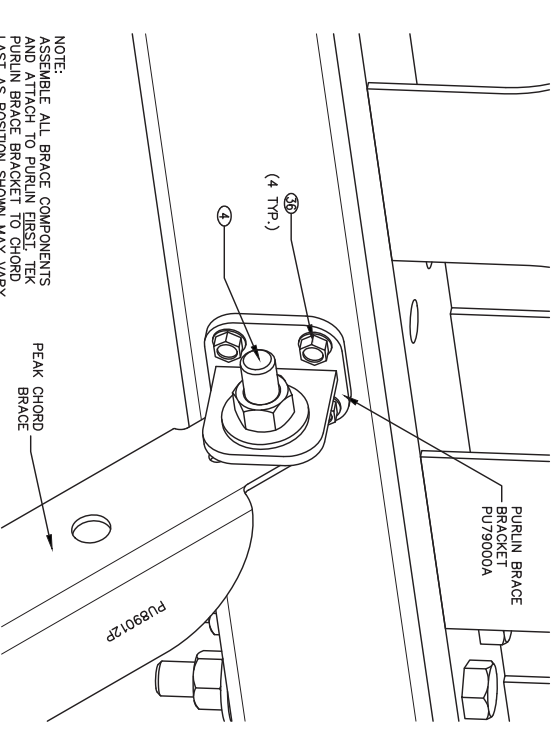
70'-80' VP PEAK REINFORCEMENT AT END TRUSS - OUTSIDE
